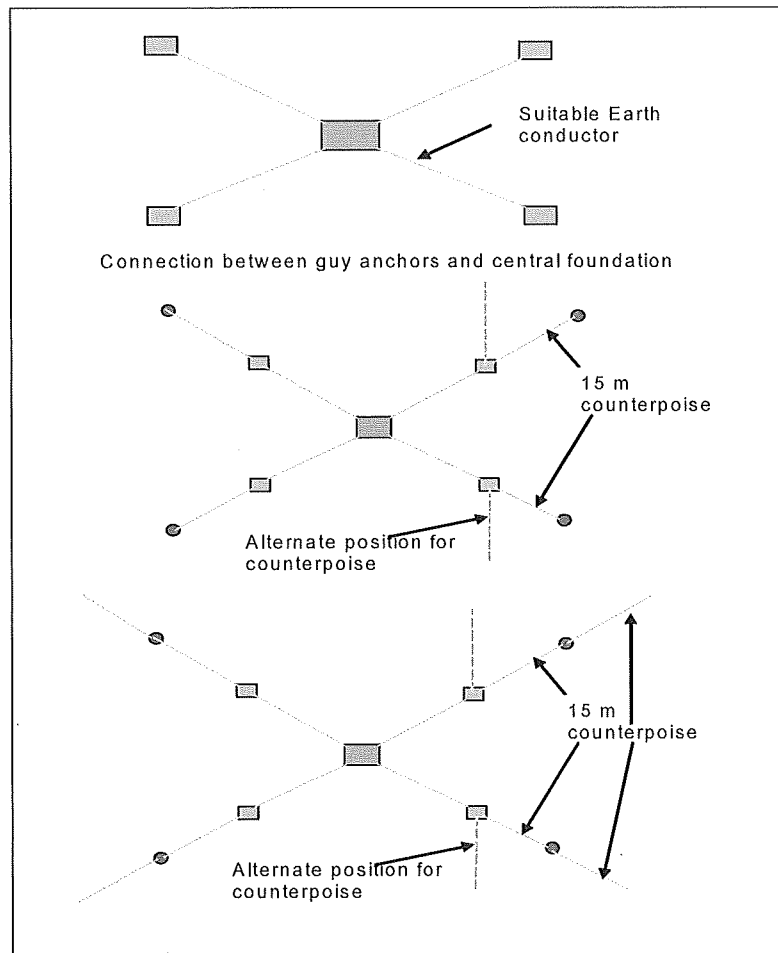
Additional Earthing for Guyed "V" and Cross Rope Suspension Towers
